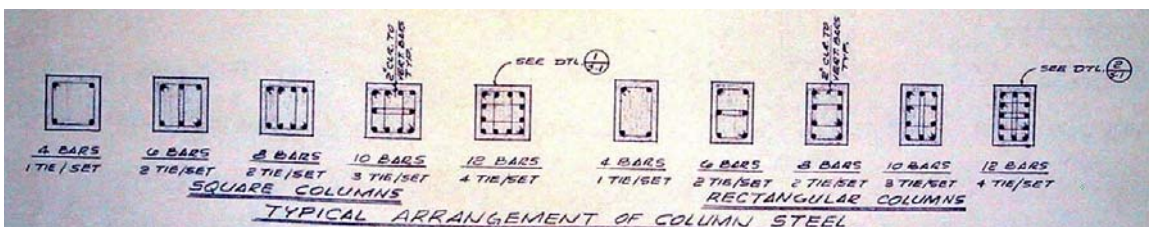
Arrangement of column steel (Rissman and Rissman Associates, 1965)
